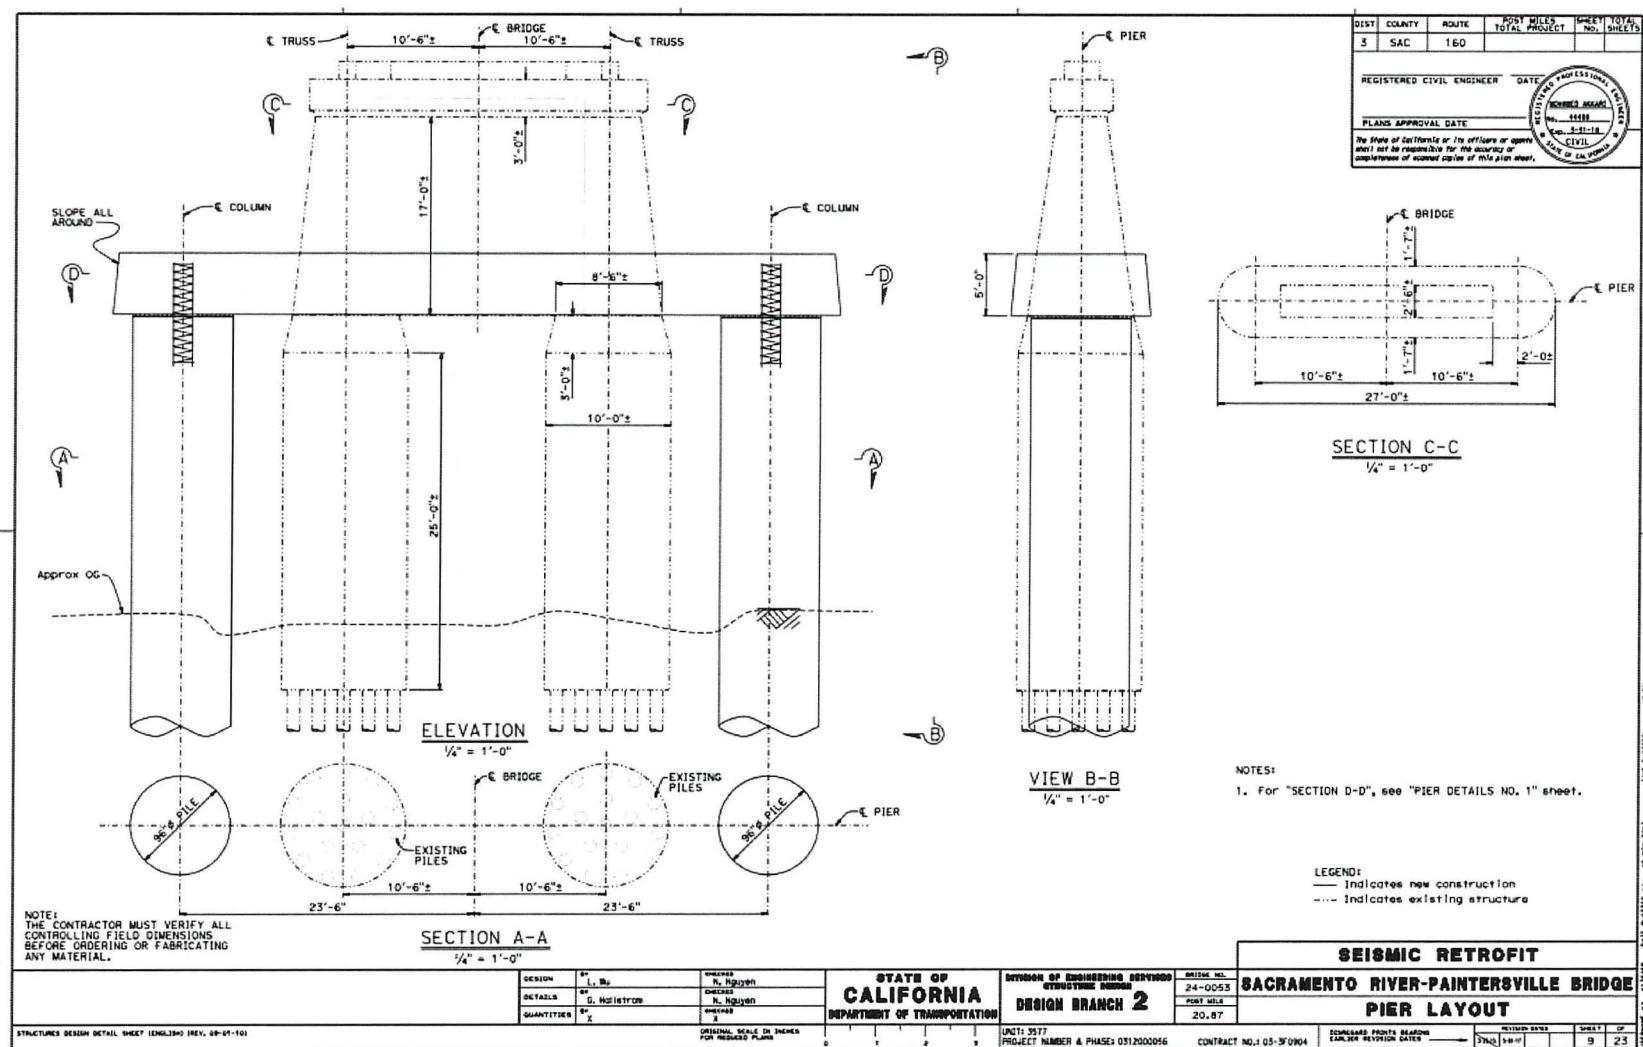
Seismic Retrofit – Sacramento River Paintersville Bridge Pier Details No.1
